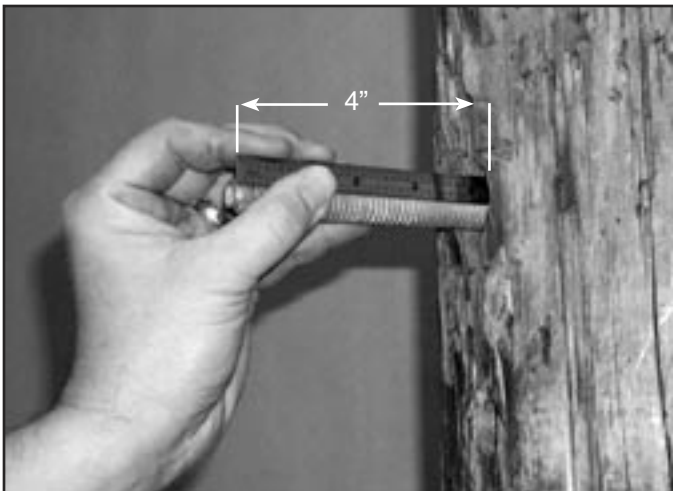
MINIMUM THROUGH-BOLT CLEARANCE
